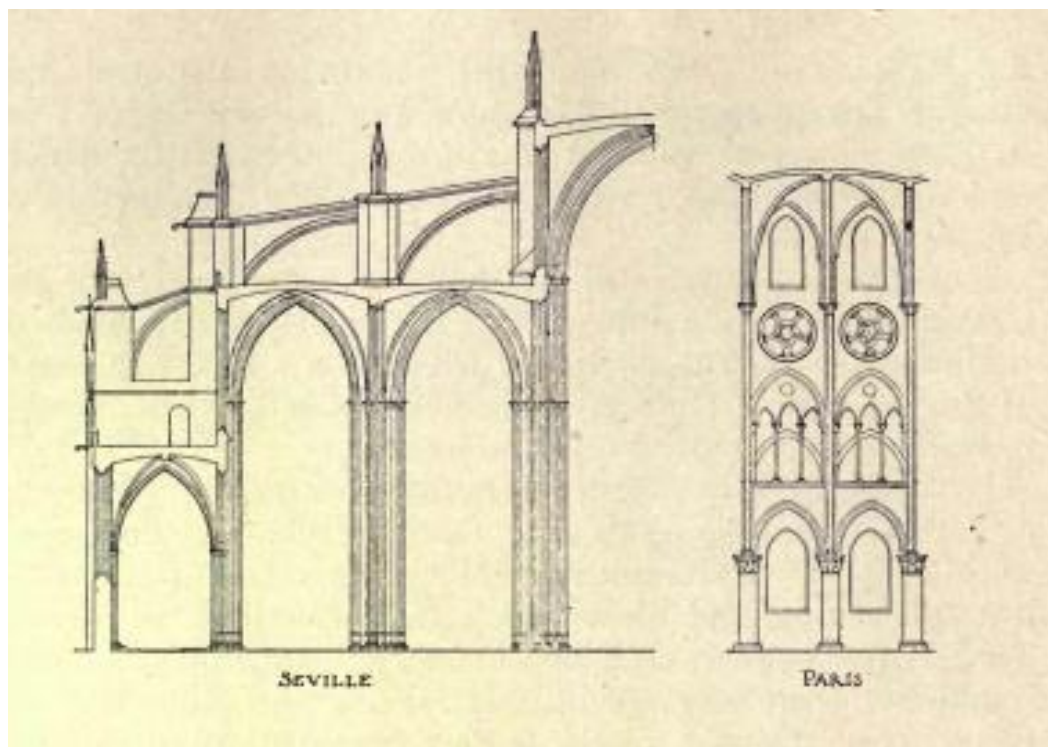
Sections and Systems of Gothic Buildings.
